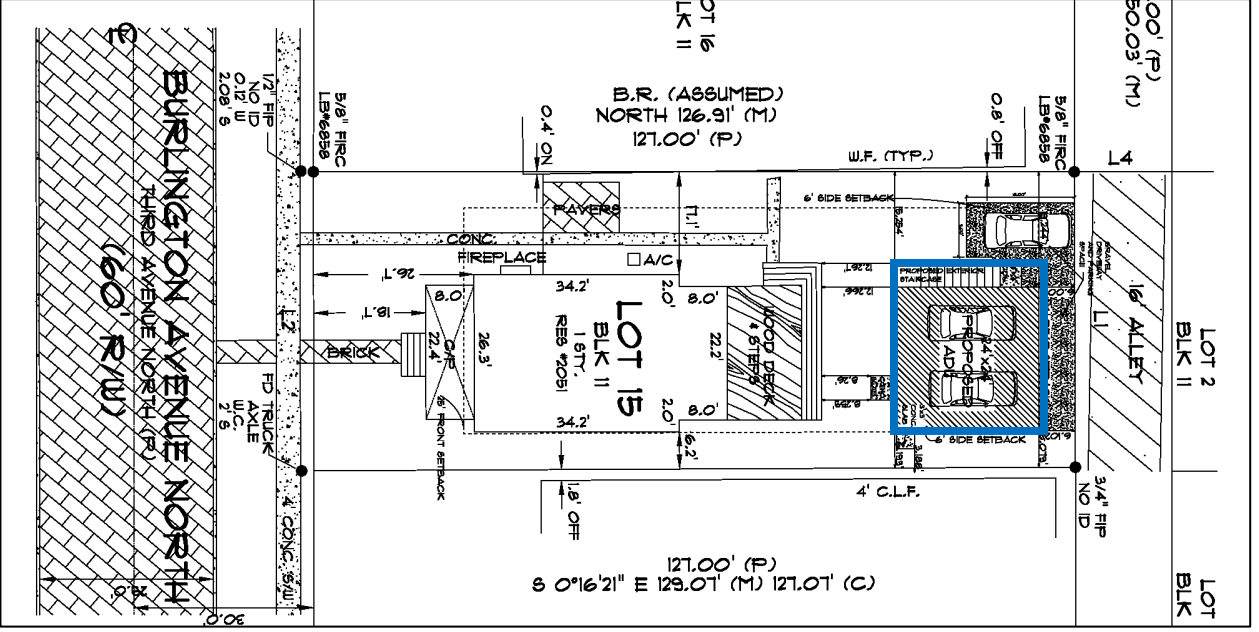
Proposed site plan from application 22-90200063. New ADU is outlined in blue.
